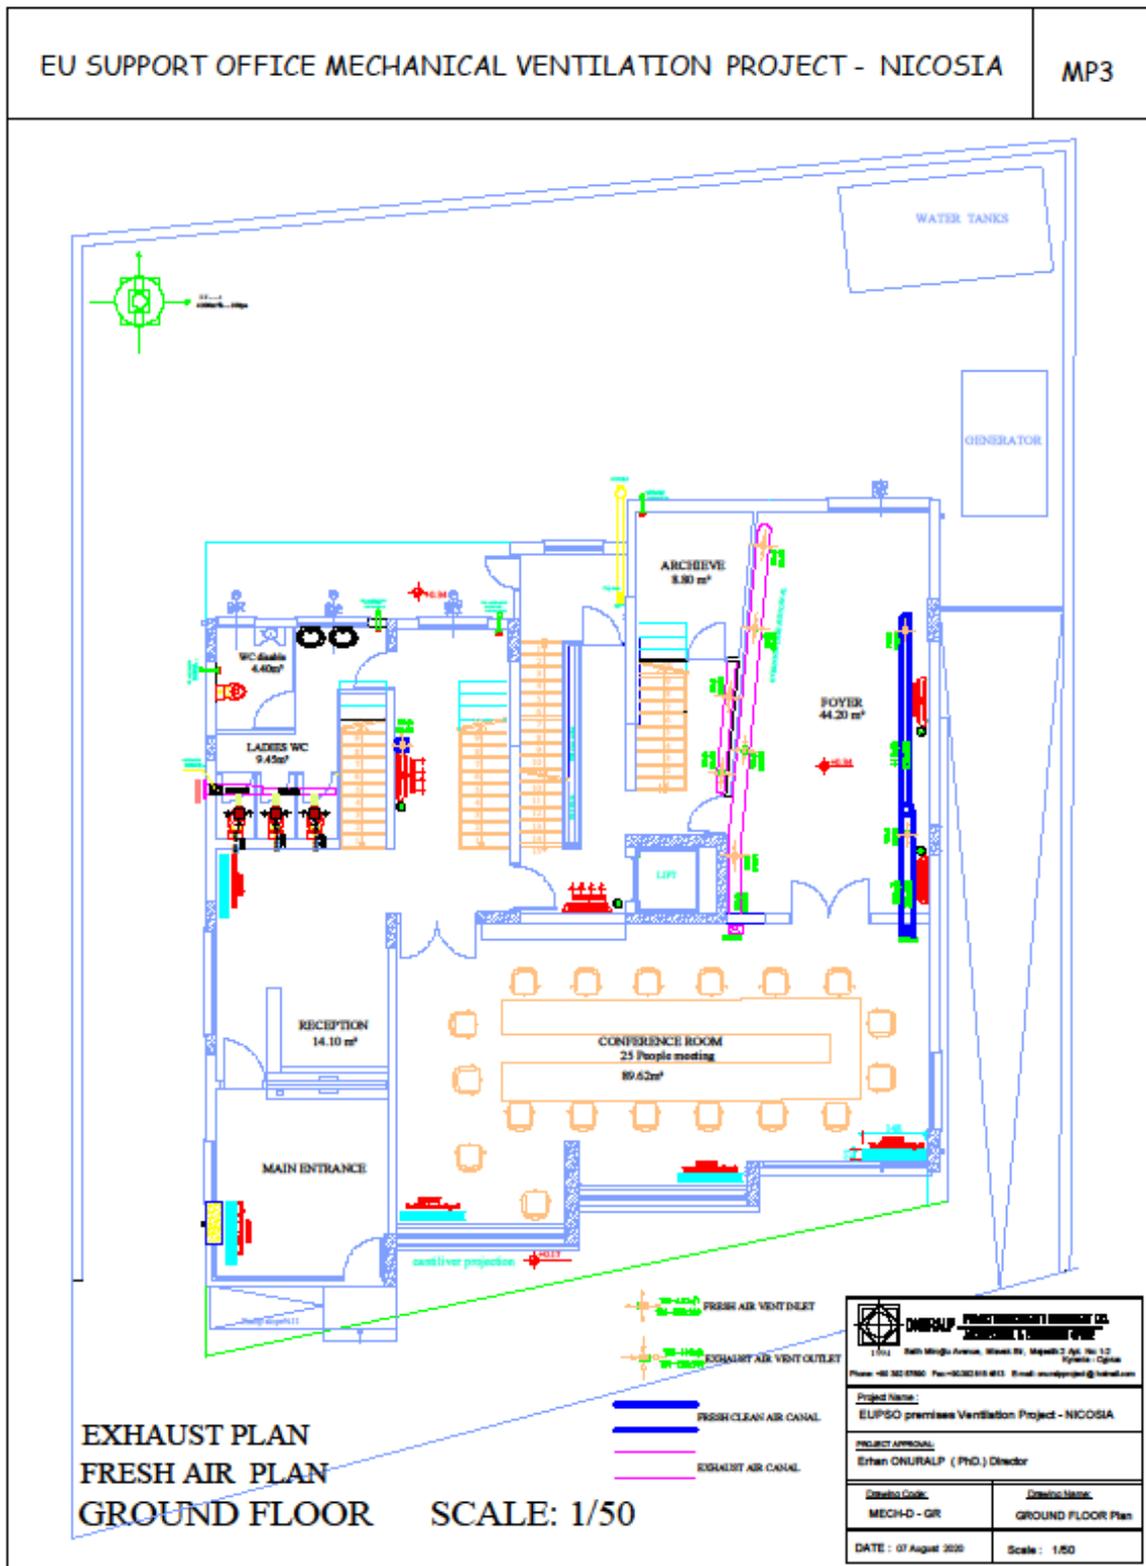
Ground Plan Exhaust – Fresh Air Planning – EUPSO project planning MP3
